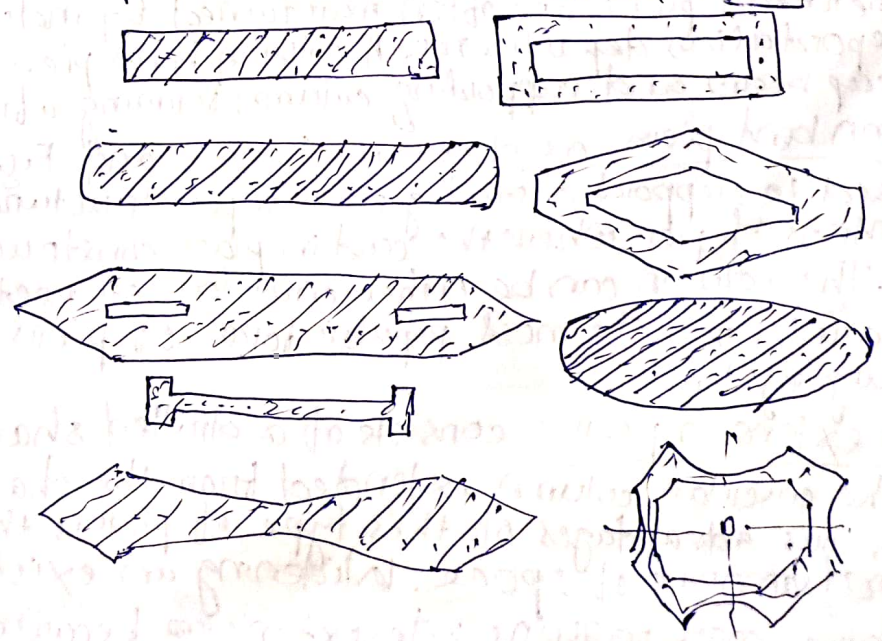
Typical cross-section shapes of piers for overcrossing or viaducts on land
